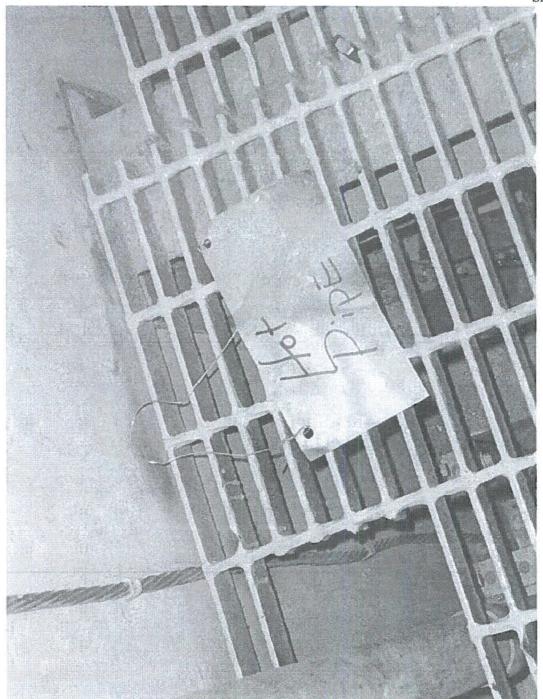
Hot Pipe Sign (Unit 2 HPCI Room)
